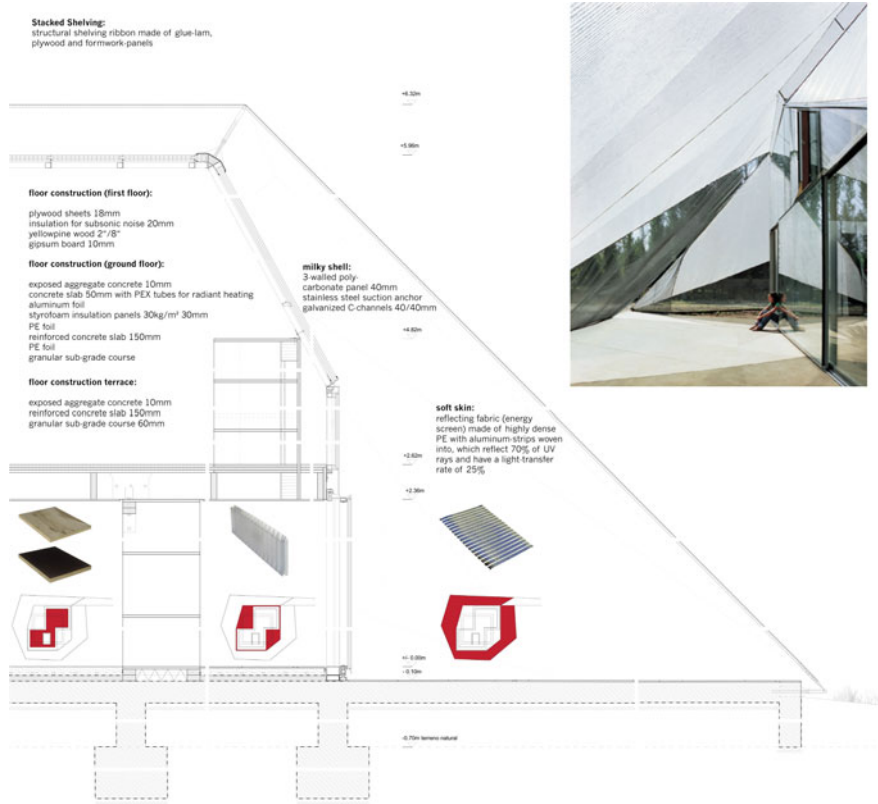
The adaptive skin.* FAR architects, vertical section of the Wall House and a view of the open air perimeter protected by the soft textile skin (Source Courtesy FAR Archives)
